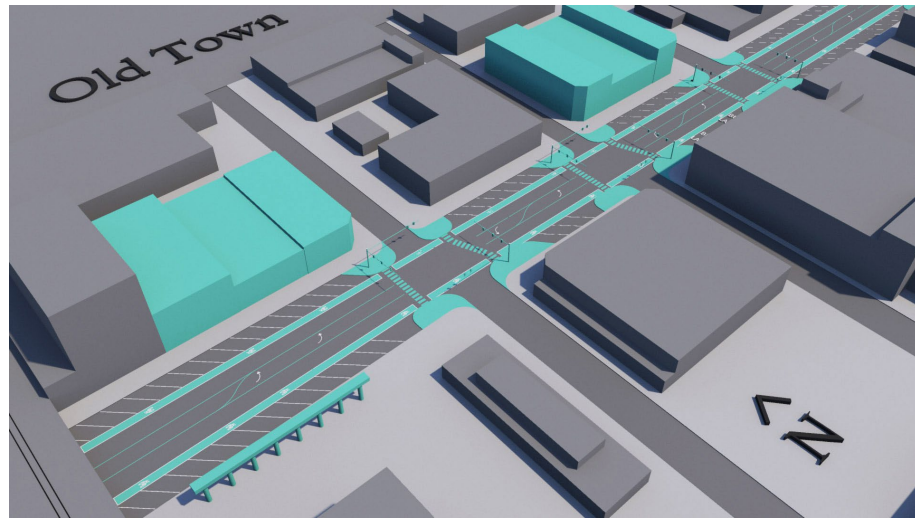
Road Diet 2: Douglas Ave. East of Bridge
